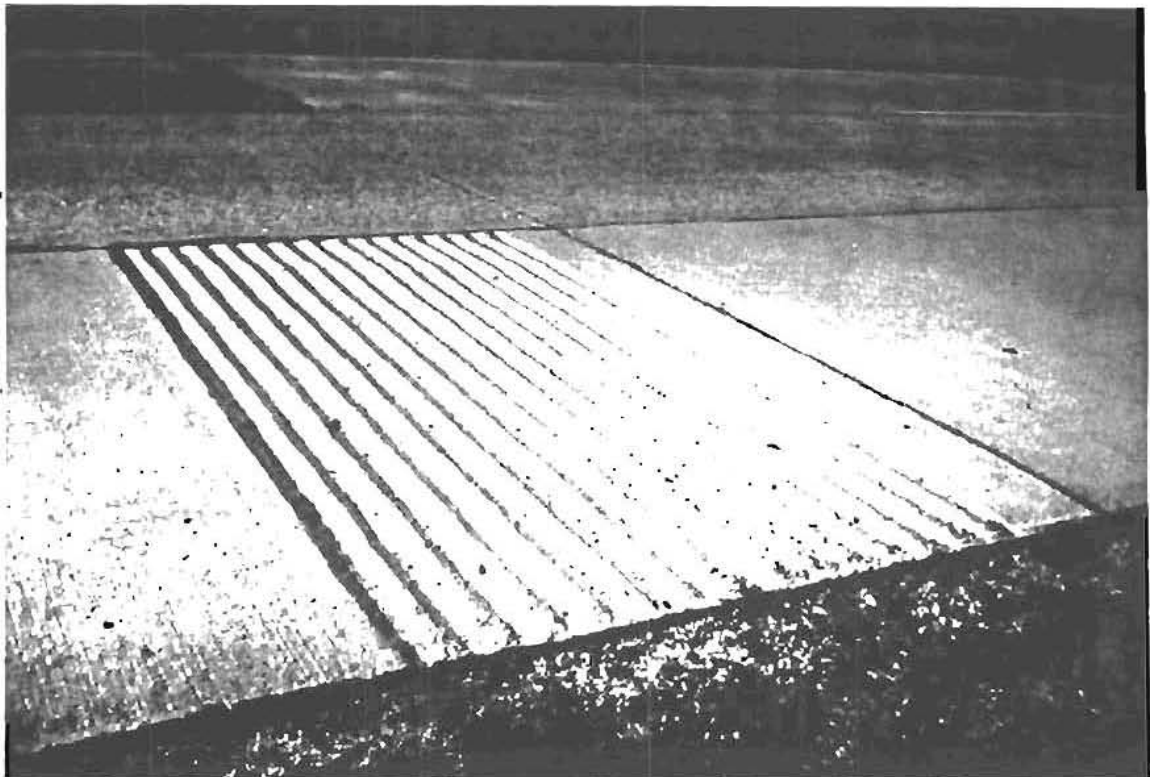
Grooves pressed into plastic concrete on the outside shoulder
